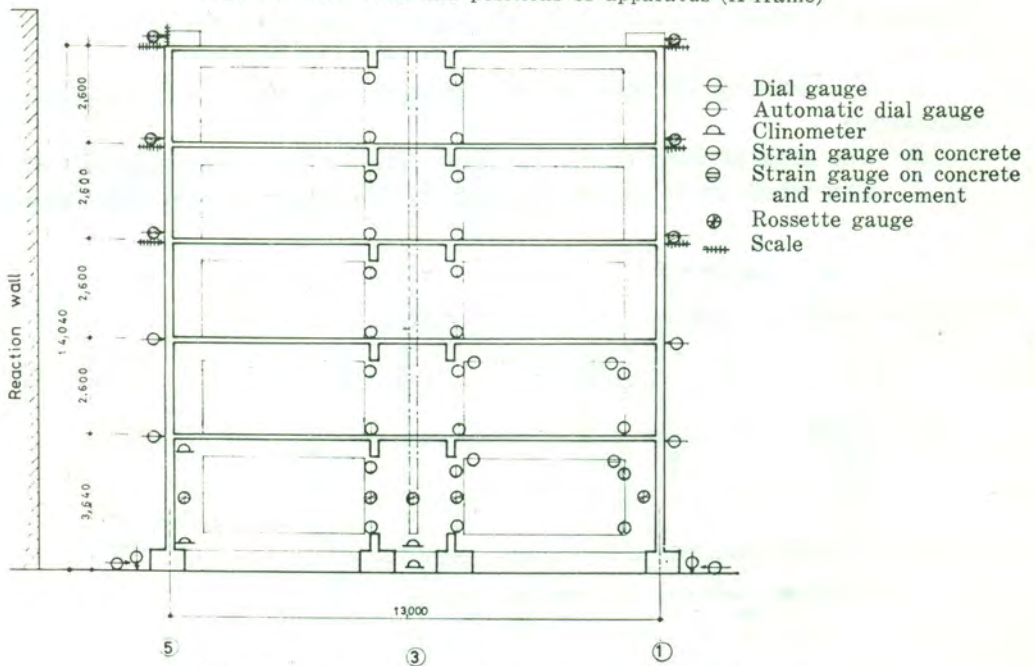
Elevation and positions of apparatus (B-frame)
